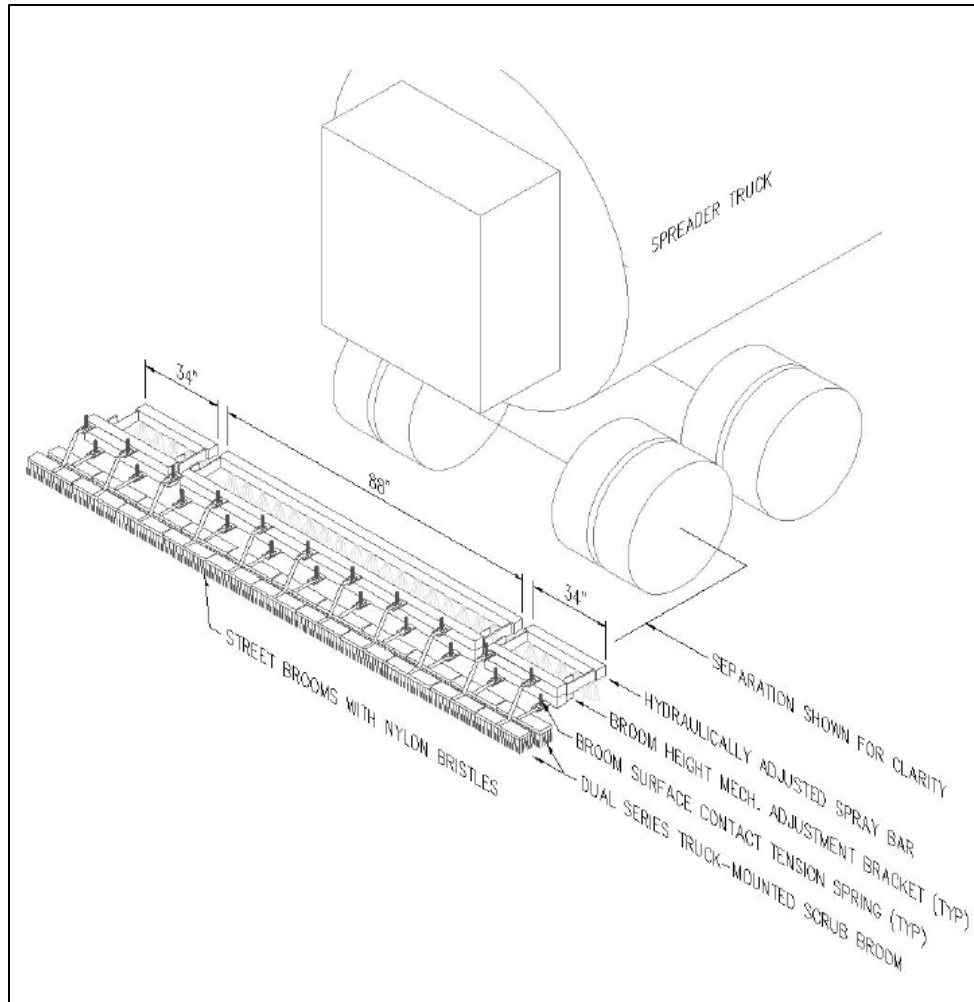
Truck Mounted Emulsion Scrub Broom Assembly
